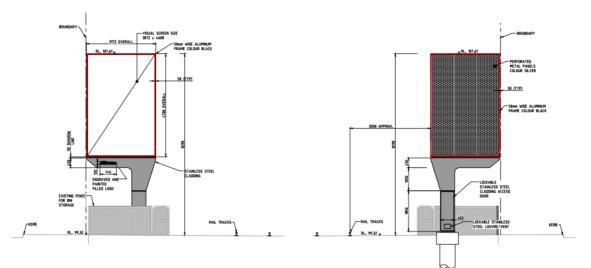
Architectural Plans (Source: Dennis Bunt Consulting Engineers)
